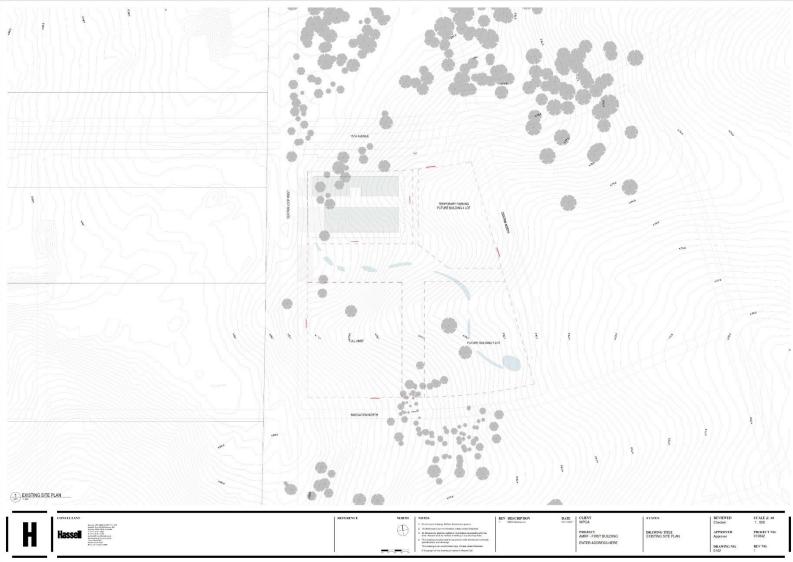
AMRF – existing site plan (Architectural drawings prepared by Hassell, 2021).
